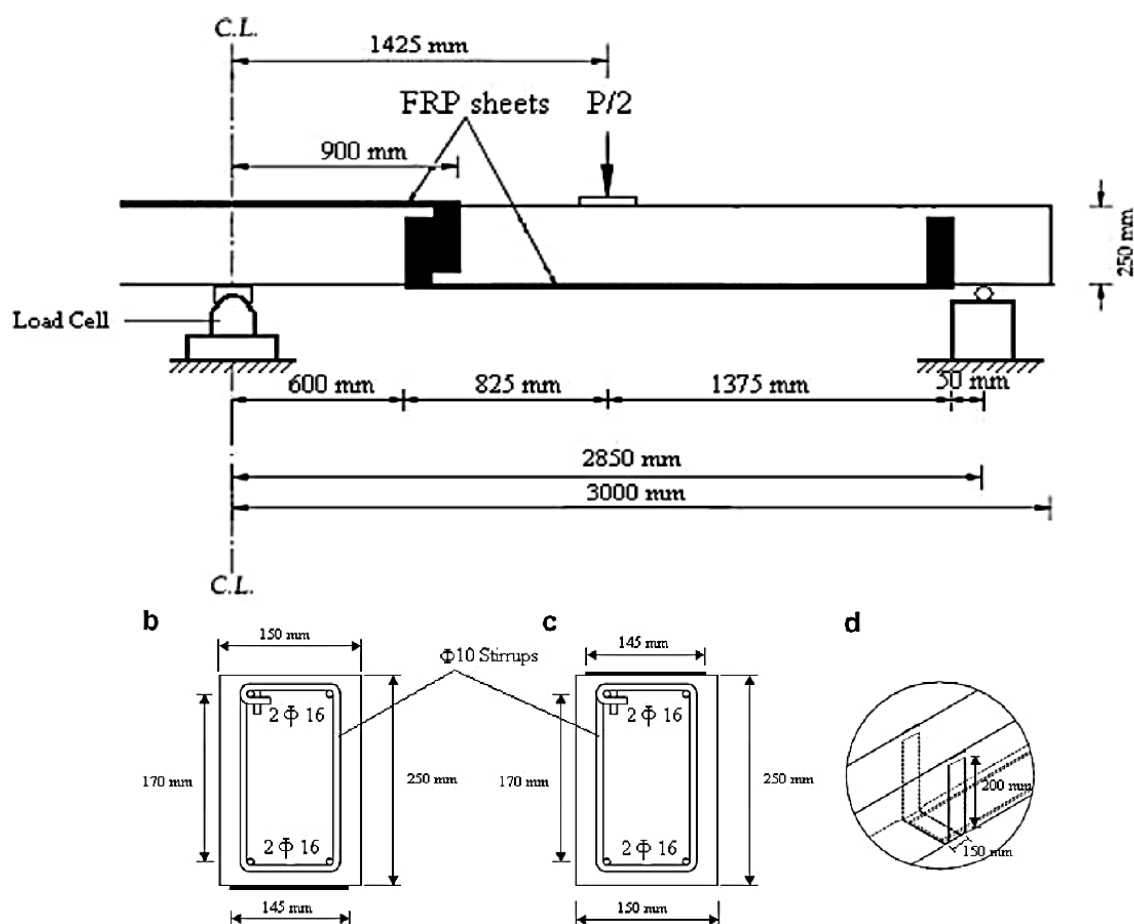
Test setup and strengthened RC continuous beam details: (a) longitudinal profile of beam, (b) typical cross section of beam in sagging region, (c) typical cross section of beam in hogging region and (d) end anchorage system (Akbarzadeh and Maghsoudi, 2010).
